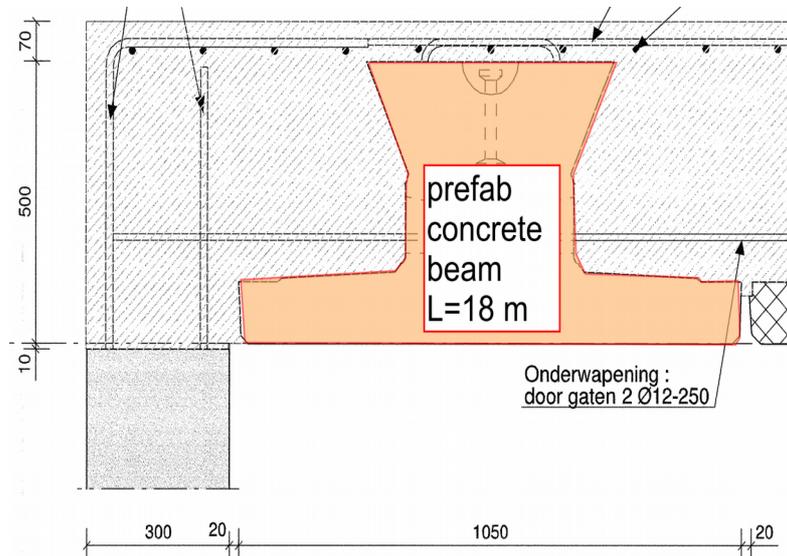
Detail inner roof large pop hall (18 x 30 m).
